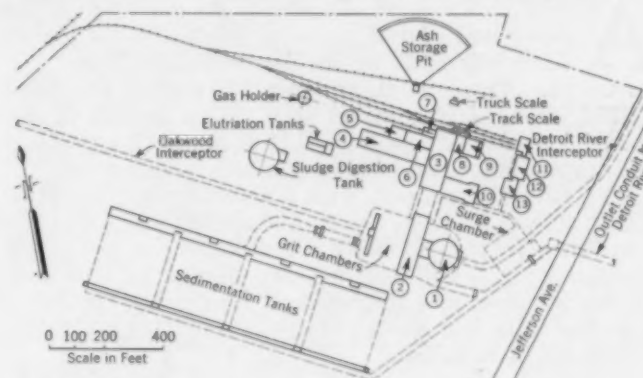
GENERAL PLAN, DETROIT SEWAGE TREATMENT WORKS
